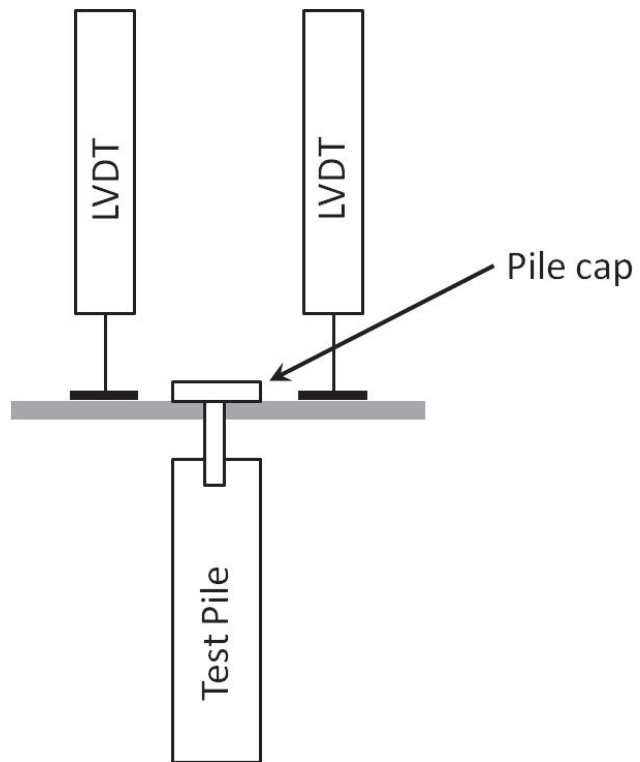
LVDT arrangement used to detect eccentric pile loading.
